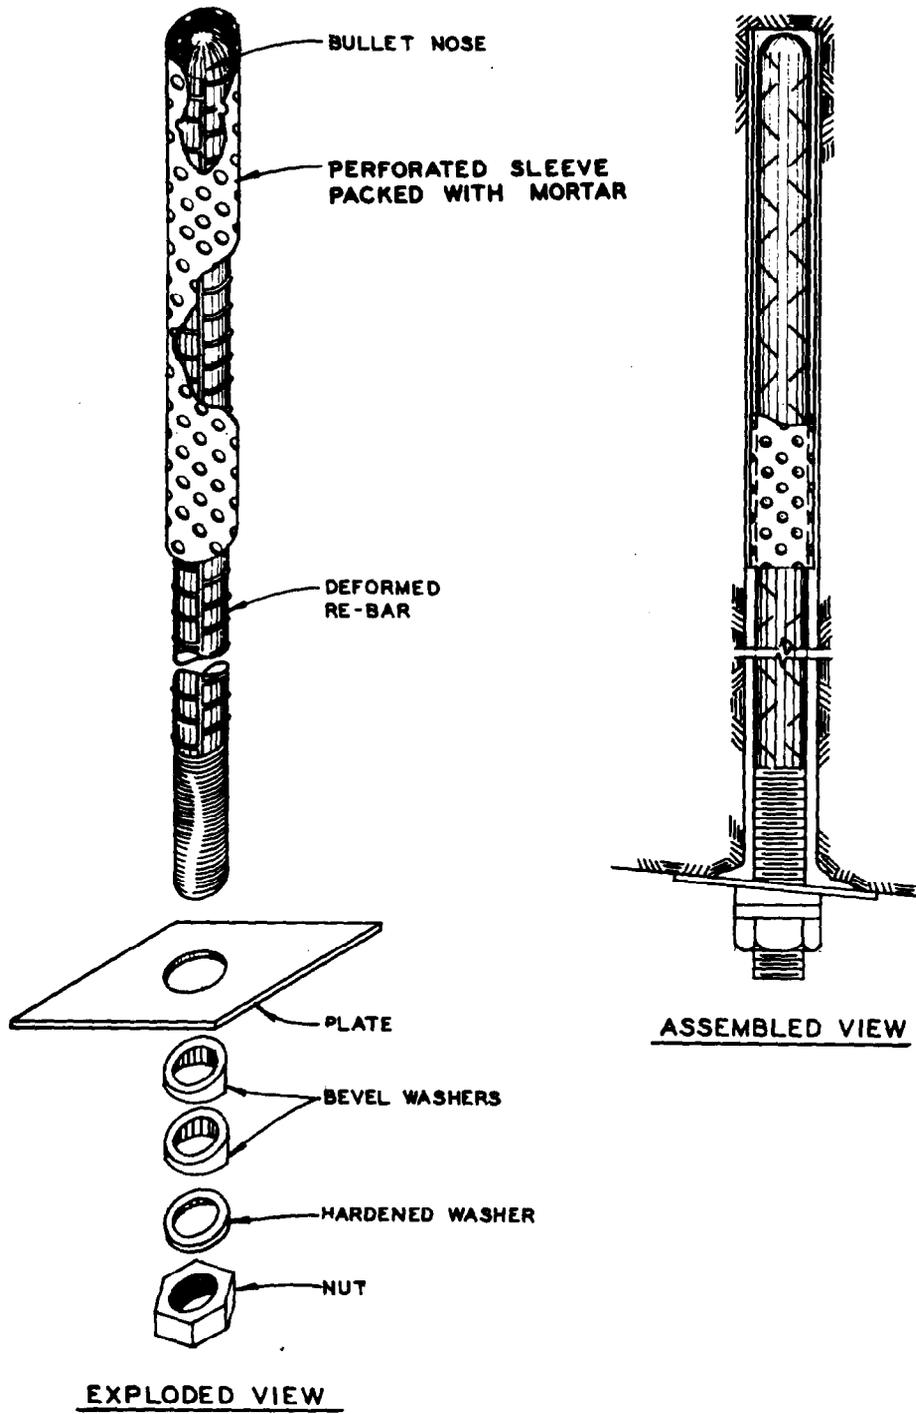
Grouted end anchorage, perforated sleeve and mortar type.
